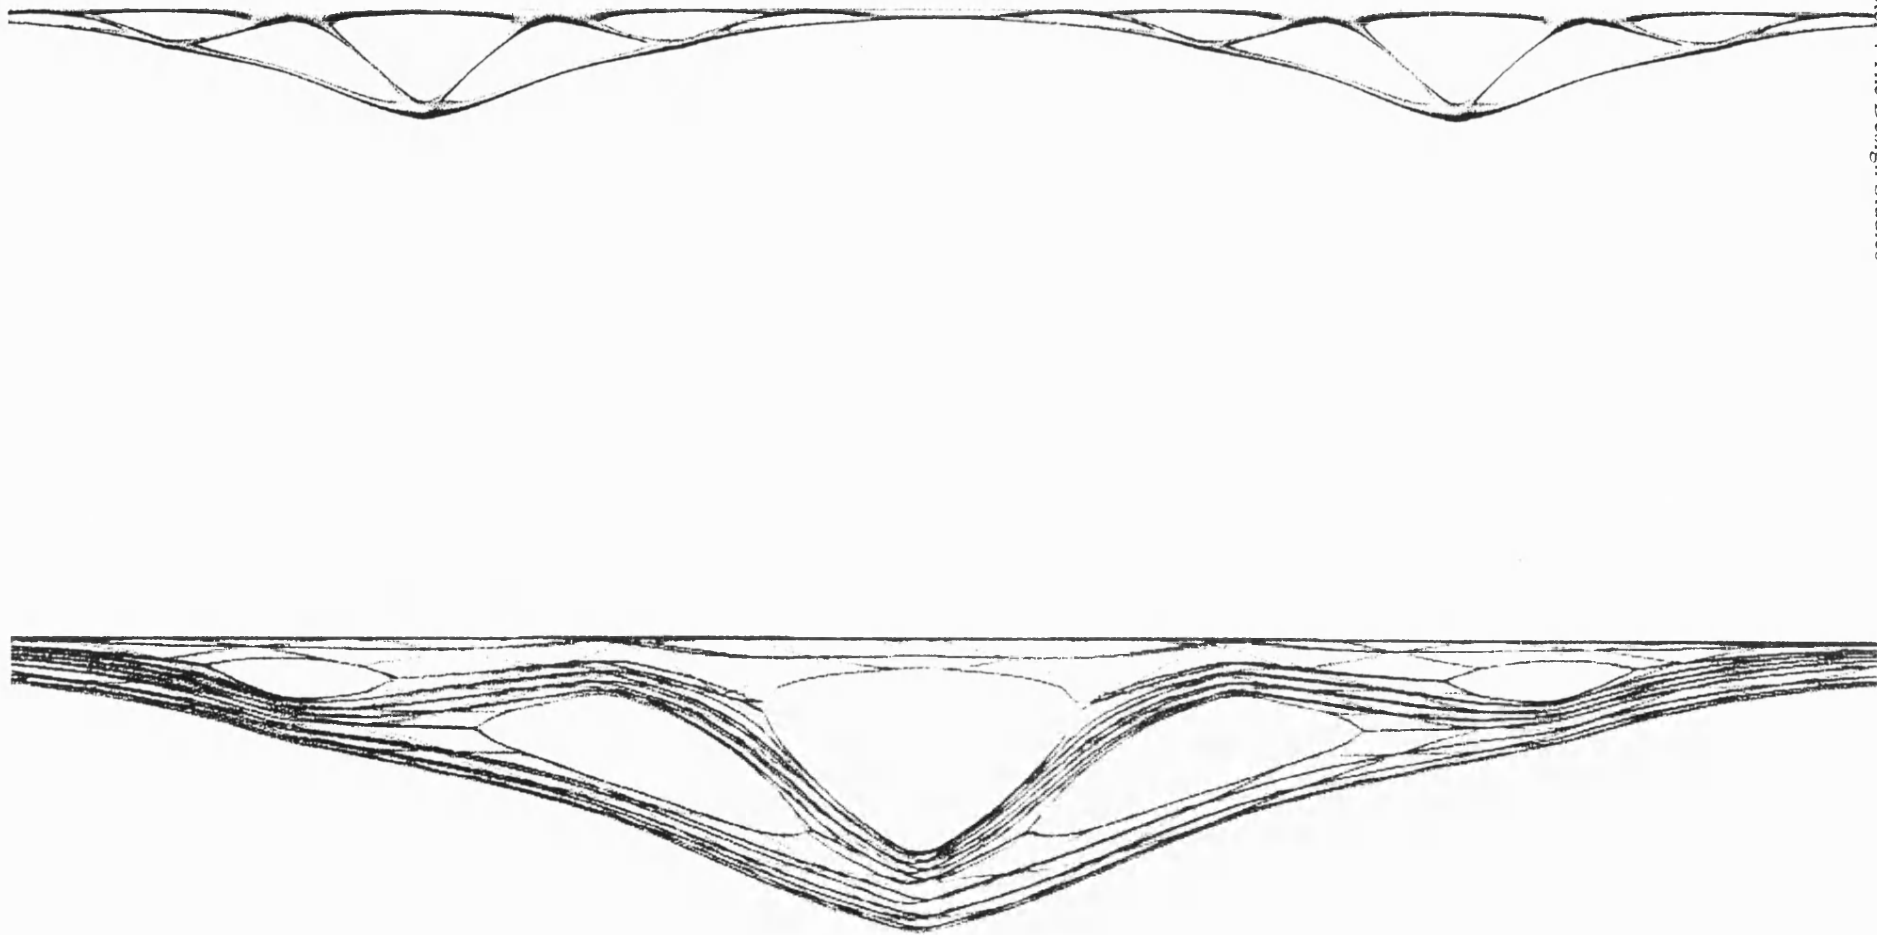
Part elevation and detail of modified Road Bridge study
